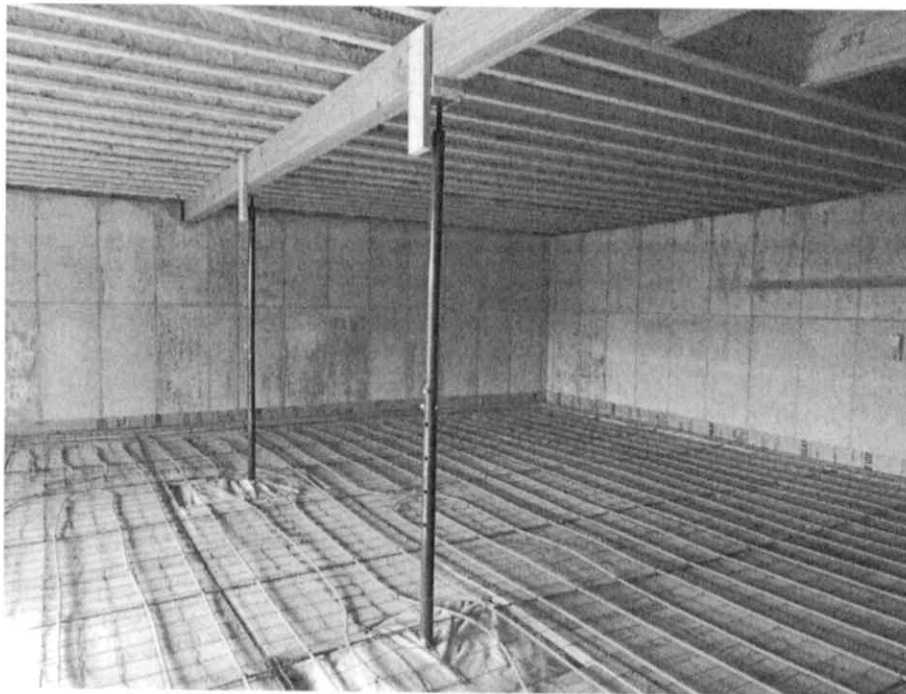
View within the basement looking northwest toward the northwest foundation wall corner.
